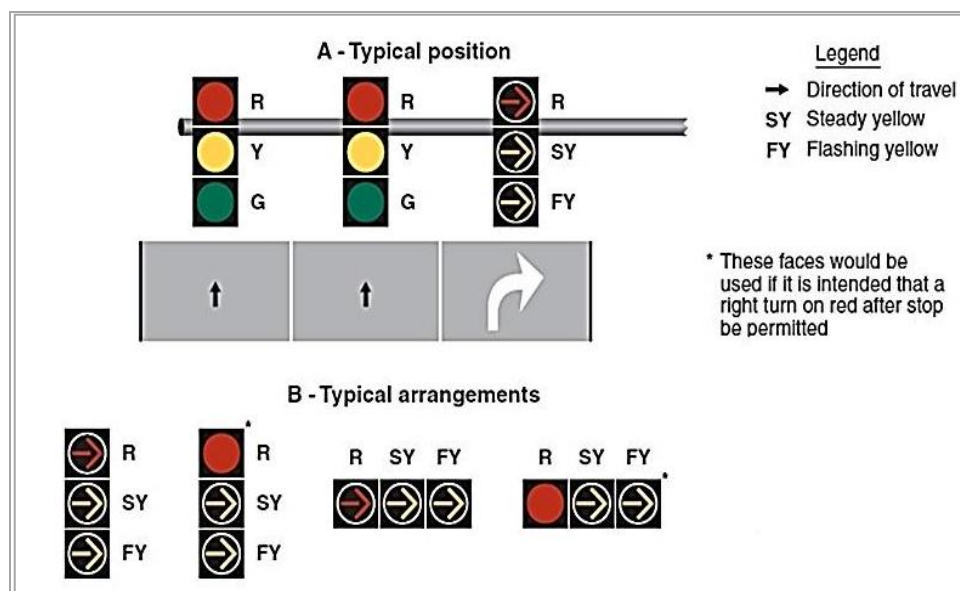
/10: Typical Position and Arrangements of Separate Signal Faces with Flashing Yellow Arrow for Permissive Only Mode Right Turns [1, p.477]
